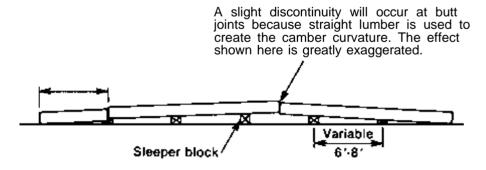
Method of cambering longitudinal stress-laminated bridge joints with butt joints.
